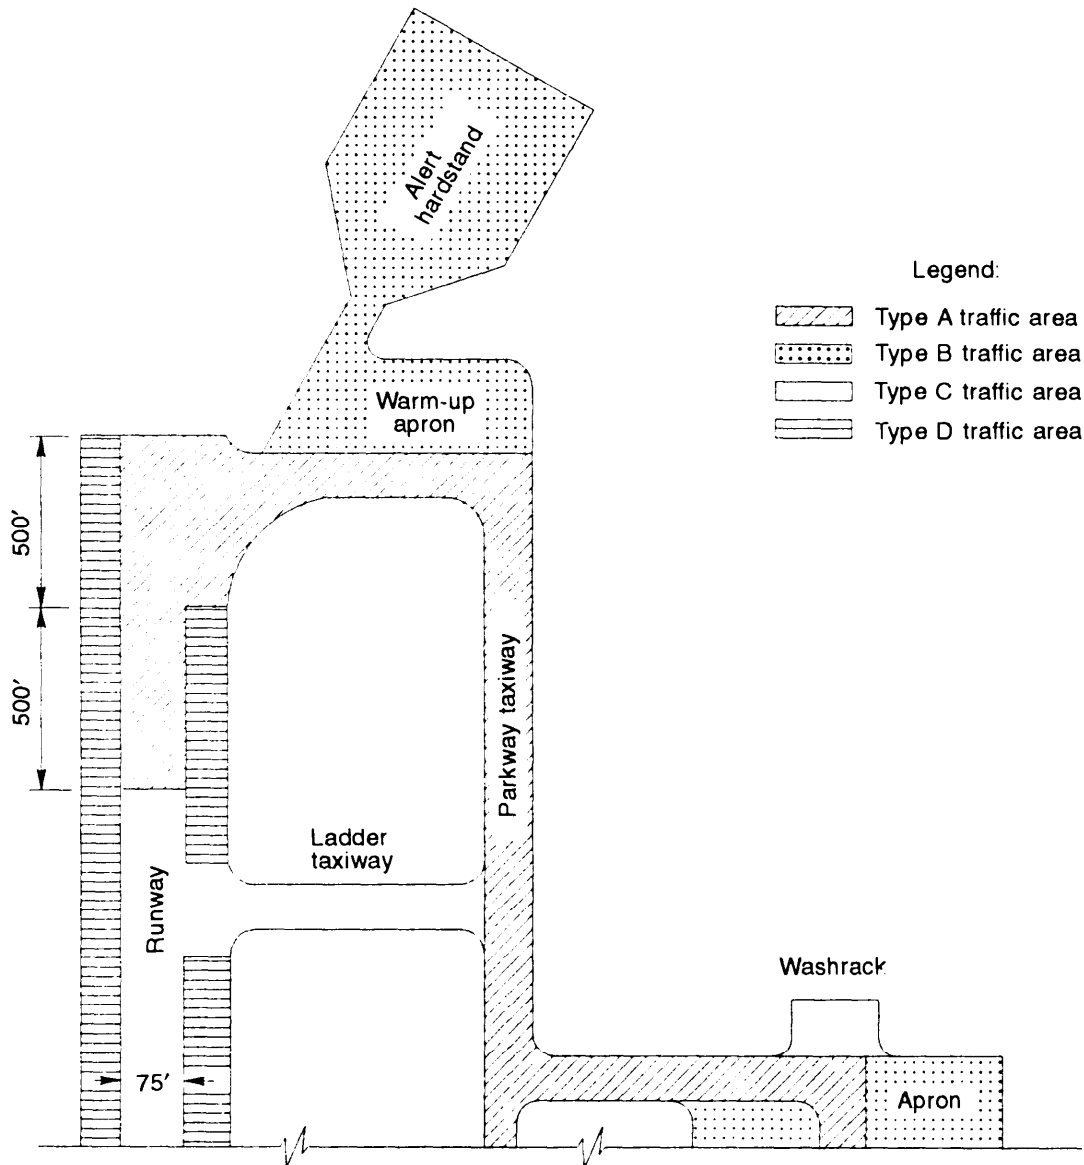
Typical layout of flexible-pavement airfields in the rear area
